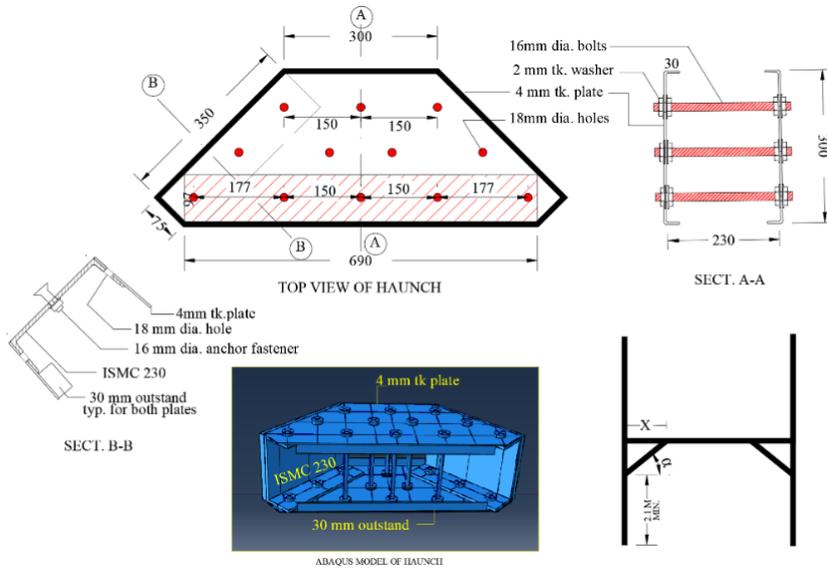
Details of 4 BDH Haunch (4 BDH to indicate 4 mm thick haunch plates)
